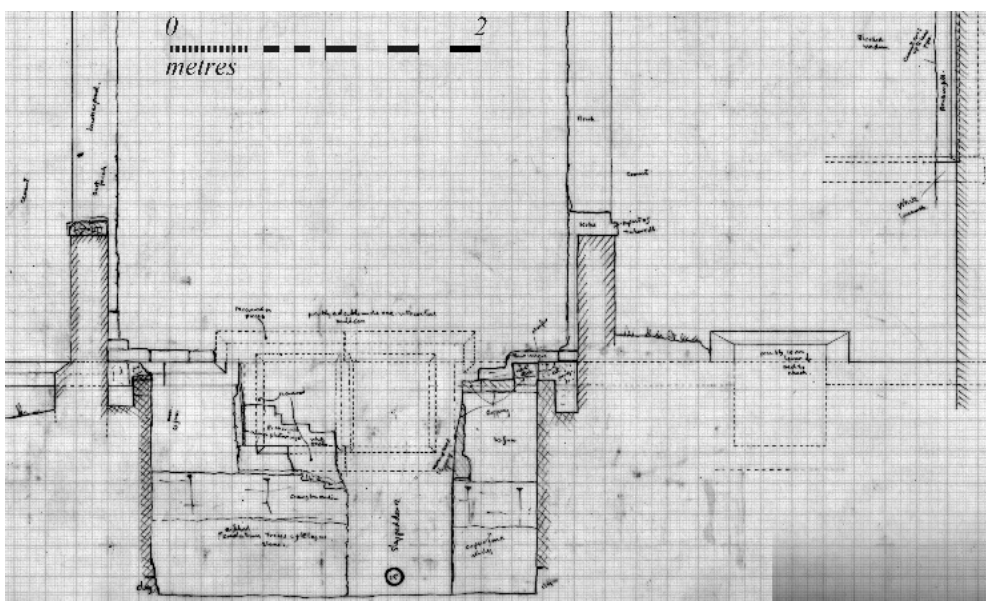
Field drawing showing details of the basement window in the west wall of room B03, partly reconstructed – dotted
